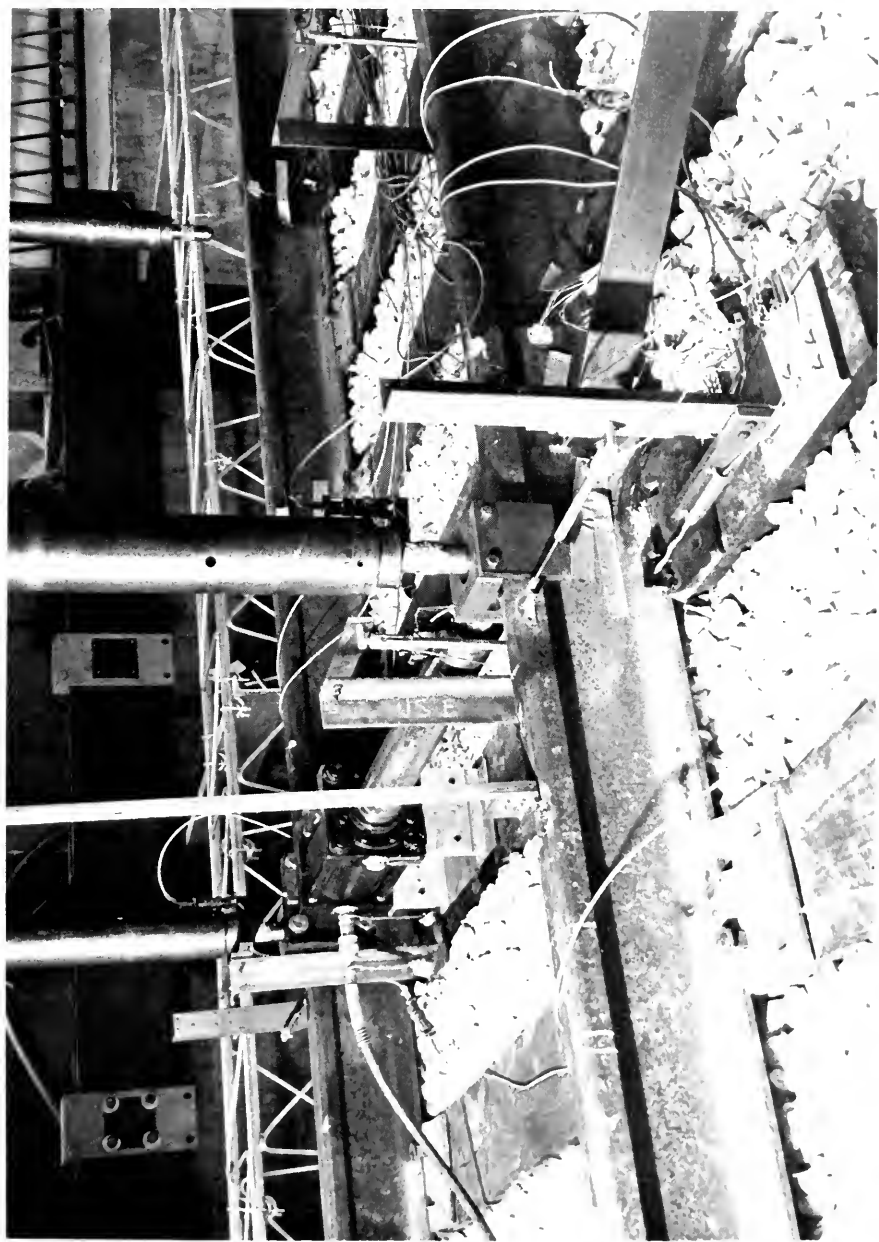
Basic Gage Widening Tests - Hydraulic Equipment for Vertical and Lateral Load Applications During Simulated Single Axle Loadings.
